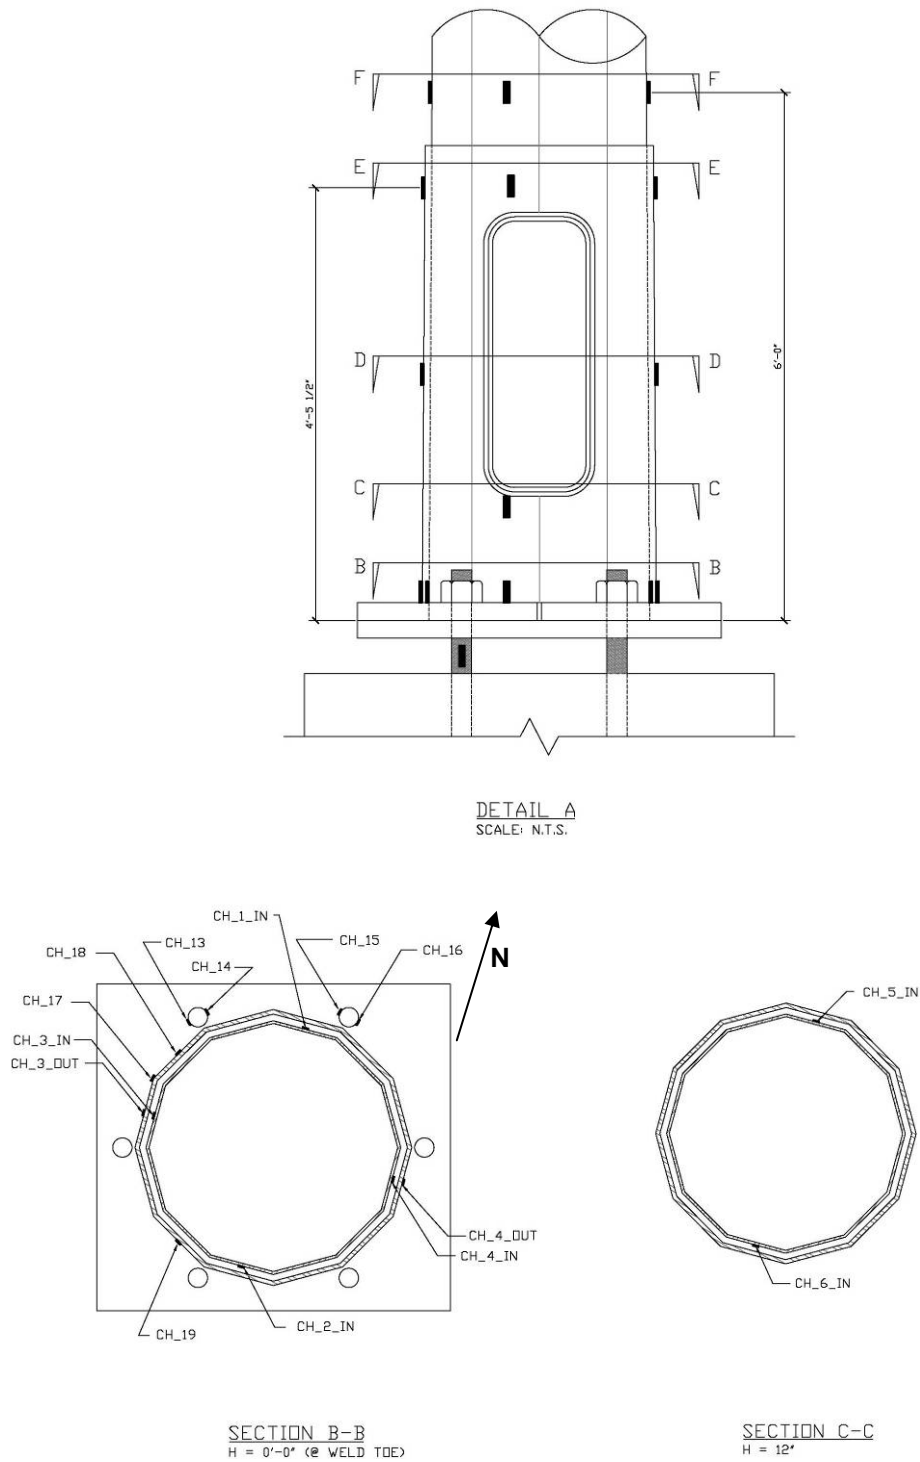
Section drawings showing strain gage locations (part 1/2)
